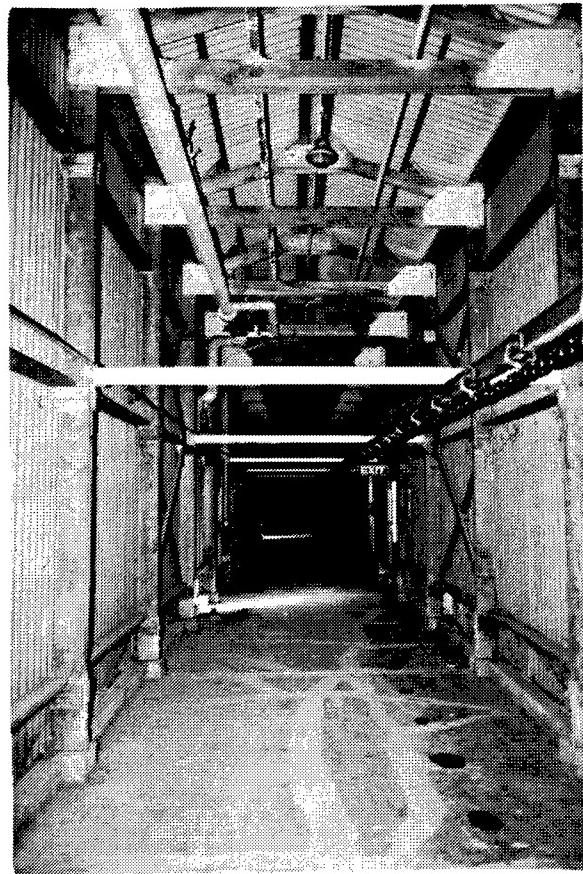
Corridor between a Cooling Building (Building G-12) and a Melt Pour Building (Building G-8).
